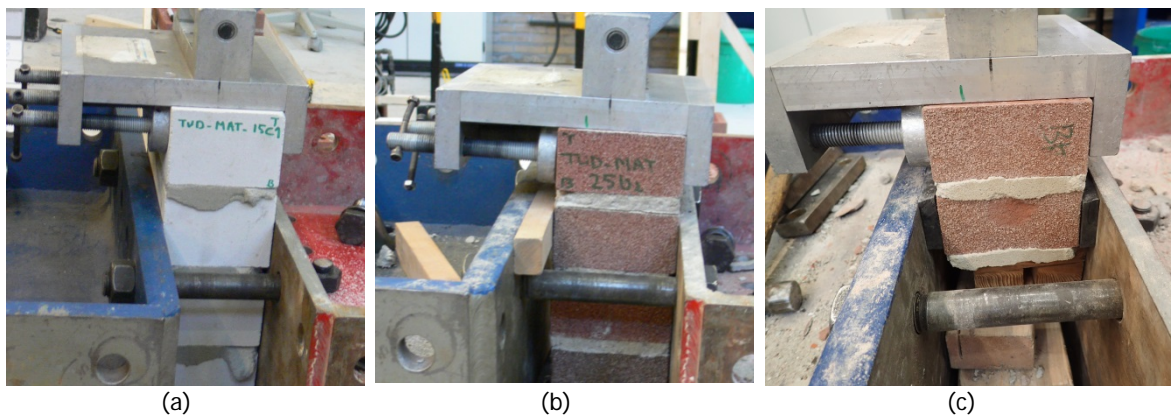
Retaining frame: (a) steel beams; (b) steel beams with a wooden strip; (c) steel beams with rubber strips.
